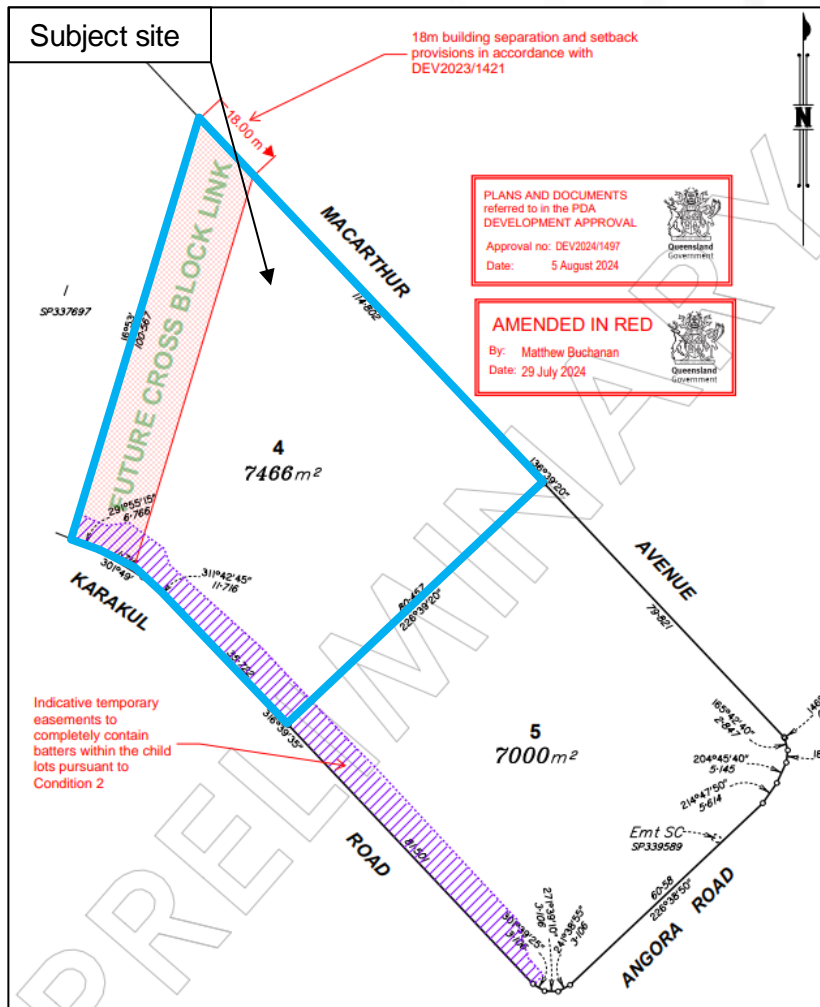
Subdivision Plan creation proposed Lot 4 (subject site) and Lot 5 (Rockpool site)
